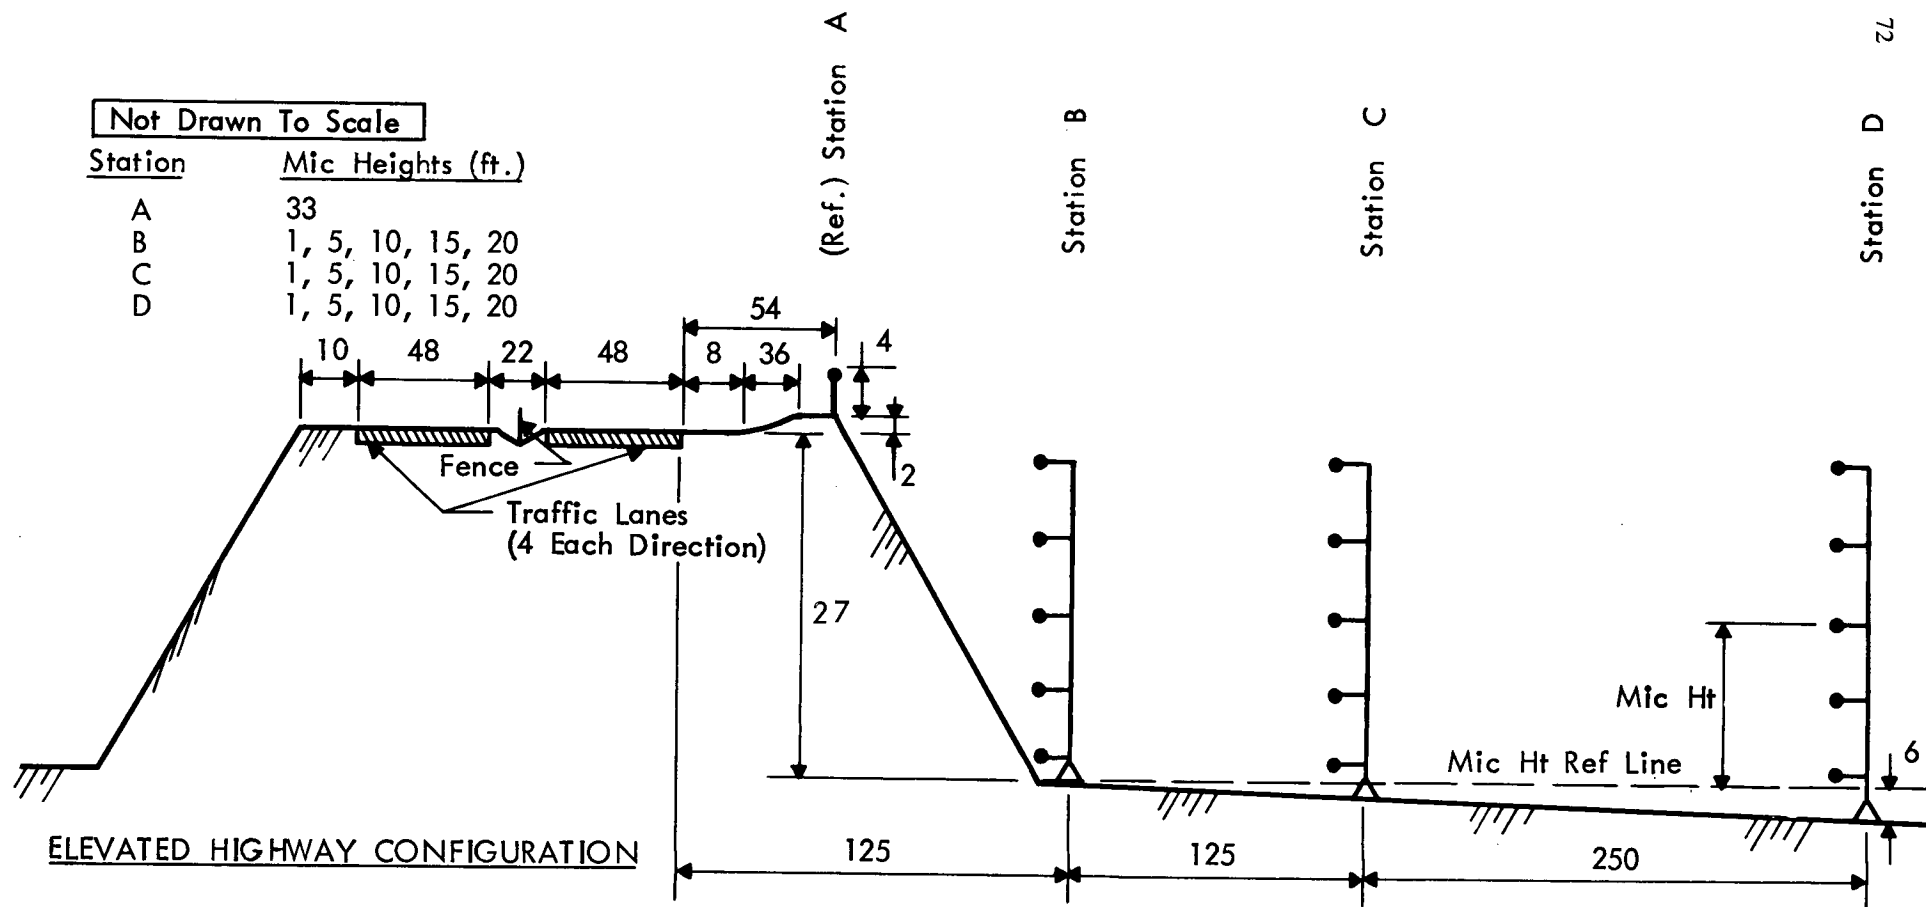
Site cross-section and acoustic measurement stations, Site 2.
